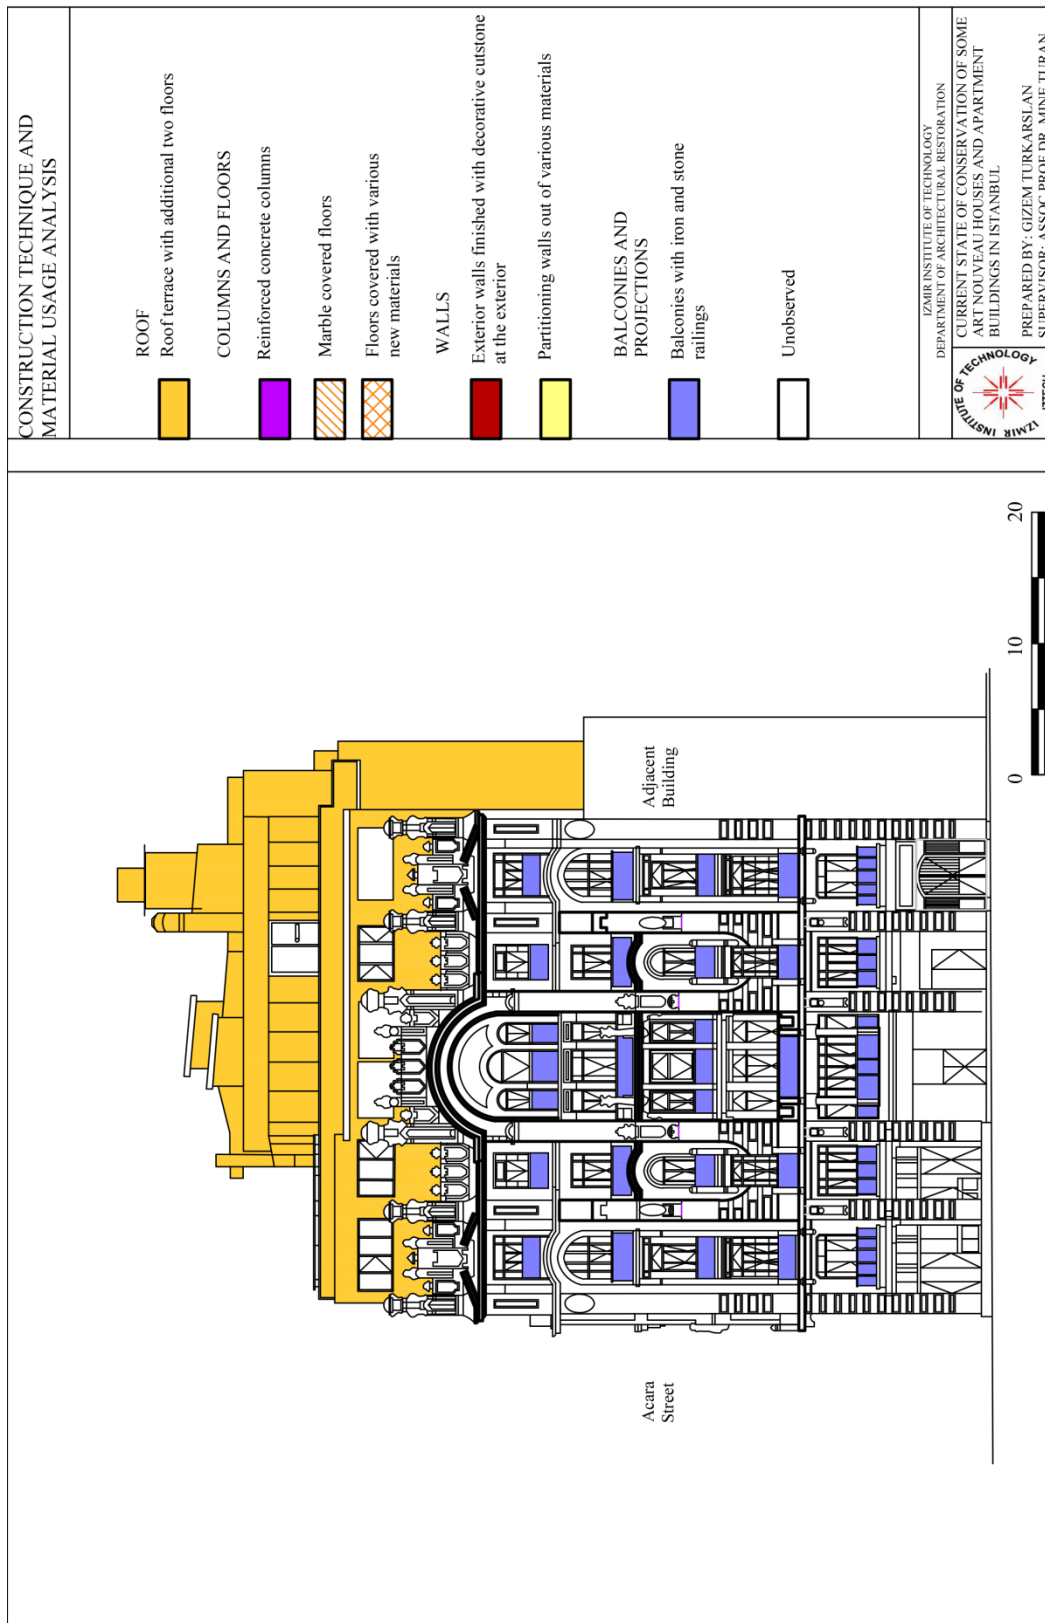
Entrance Façade, Construction Technique and Material Usage Analysis of Misir Apartment Building
